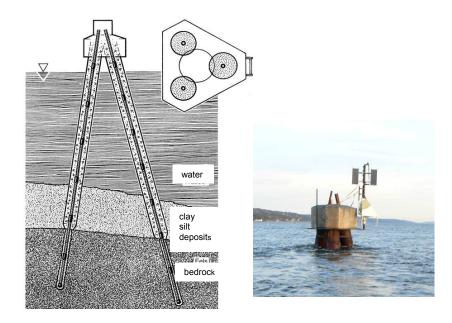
Navigational Aid founded on driven pipe piles, which are reinforced with TITAN 73/45 micropiles
